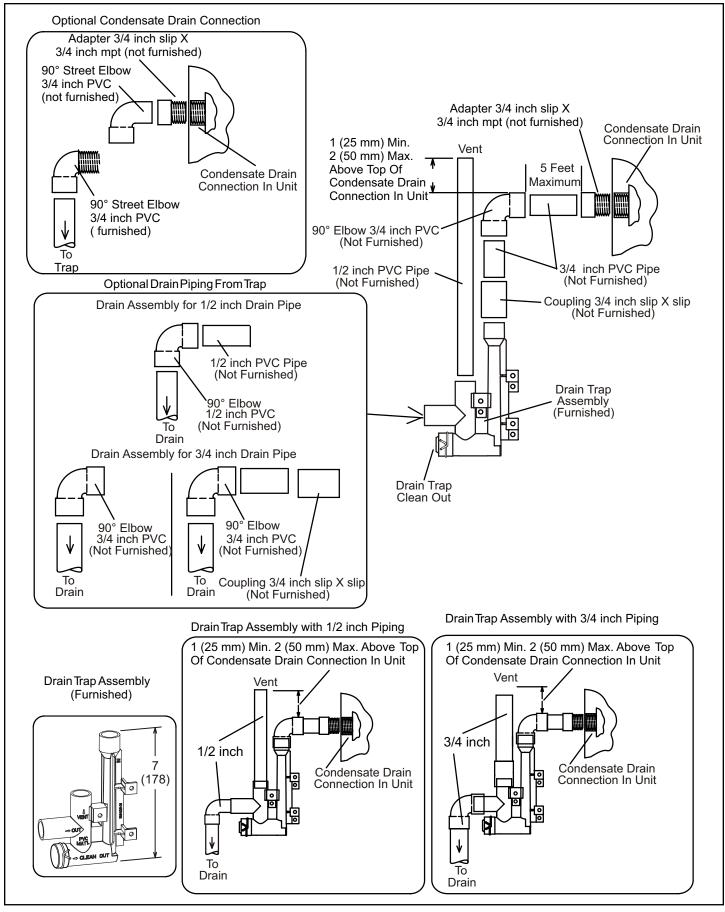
Trap / Drain Assembly Using 1/2" PVC or 3/4" PVC Cold End Header Box with 3/4 Drain Connection
